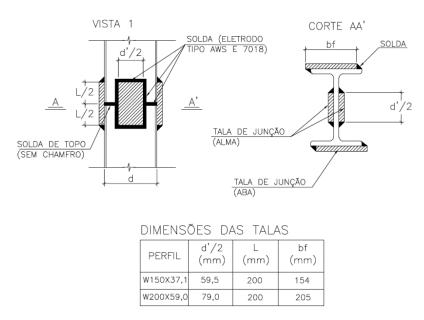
Detail of splicing of steel piles. Source: Foundation project (2015)
